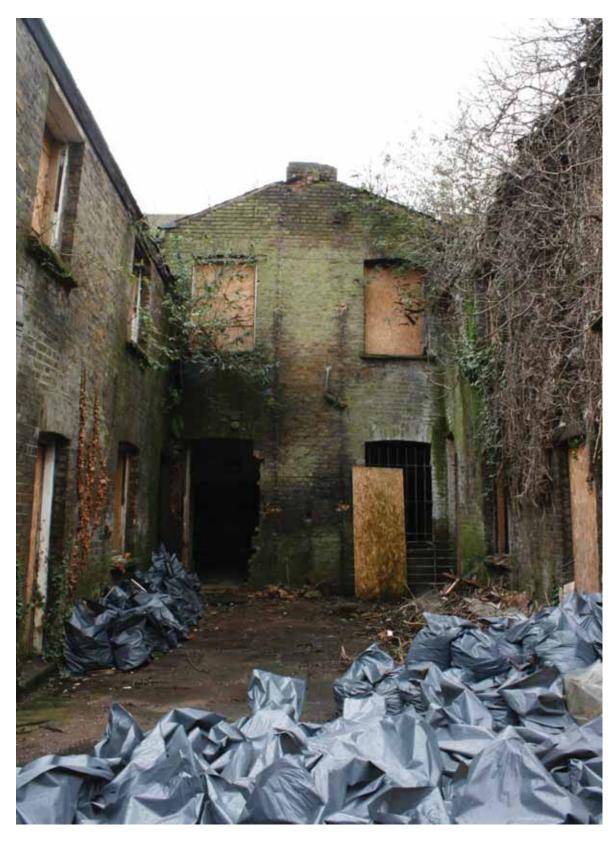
Rear (north) elevation of 204 (left) to 205 (right), Grange Road, looking south (PCA Archive no. GBR12 D100 (8))
